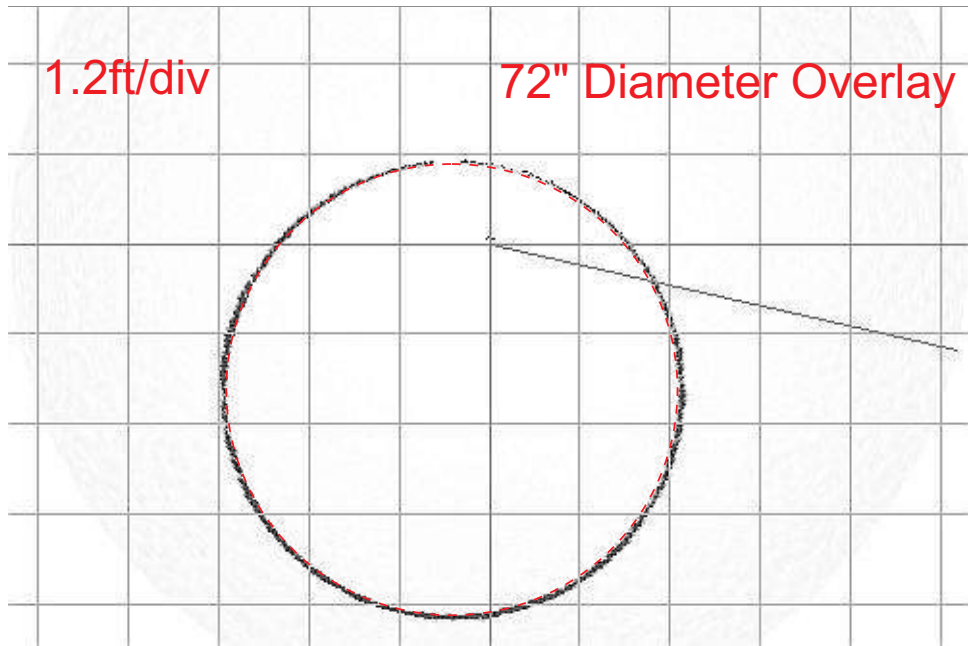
Sonar Profile 11 - 284 feet downstream of Access Point 1.
